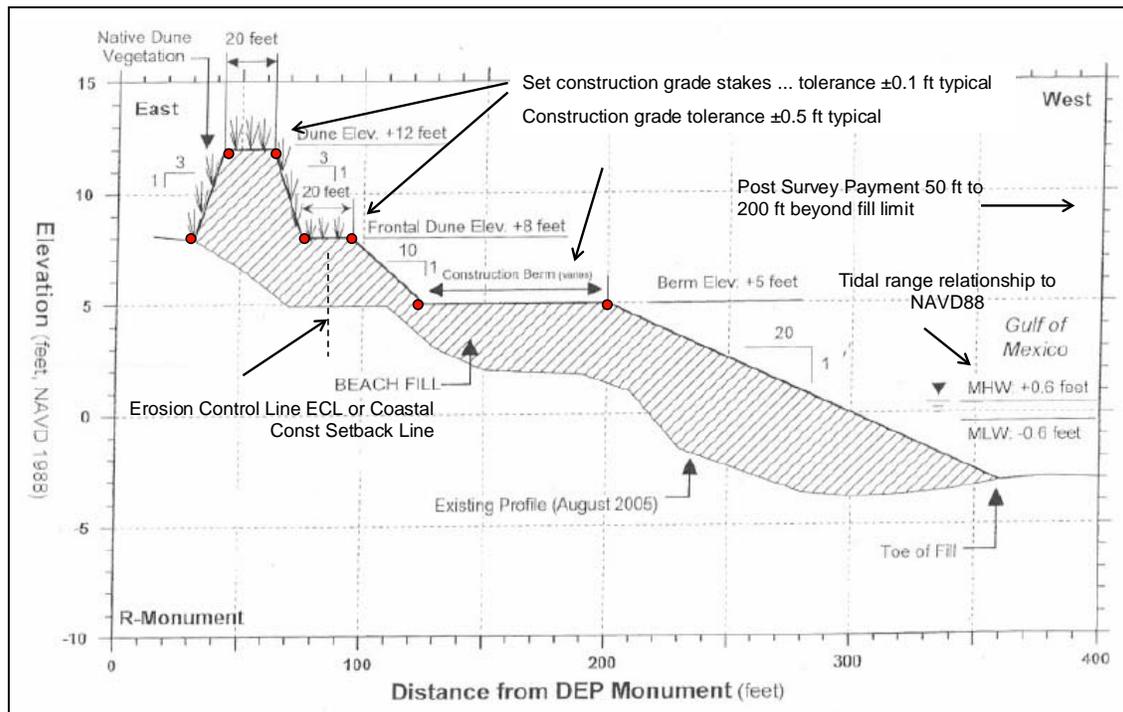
Beach profile template used for construction stake out and measurement & payment surveys.
